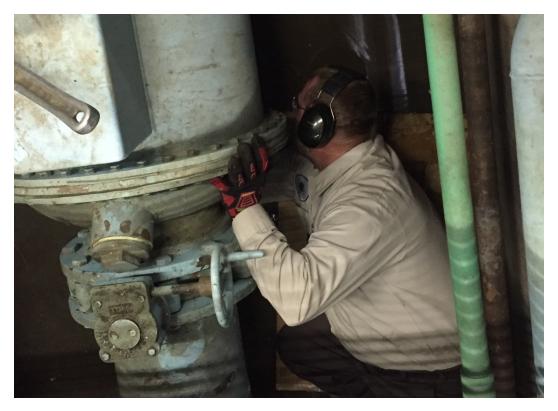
MECHANIC REMOVING PLUG AT LOWER HAND HOLE
